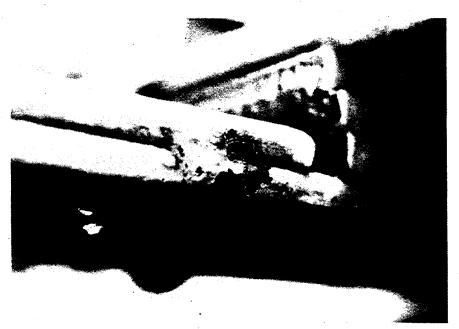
Close-Up of Tack Weld on a Riveted Built-Up Truss Member
